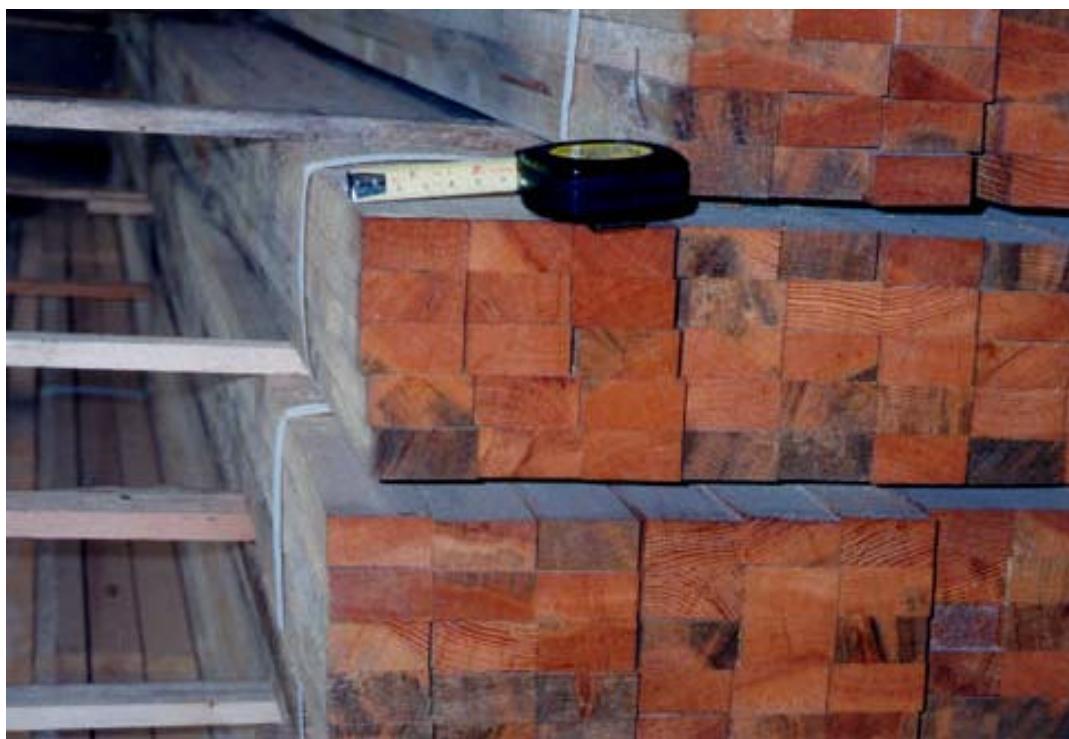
Wood dobuchi strips (20mm by 40 mm) are used in the rain screen siding system.
